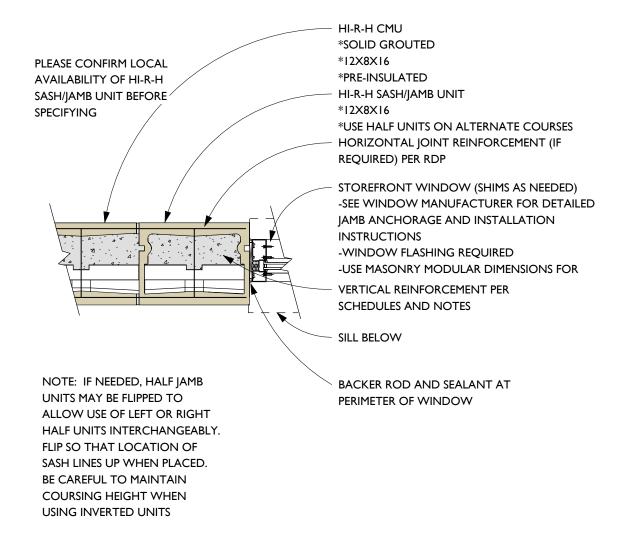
HI-R-H - Window Jamb with CMU Jamb
